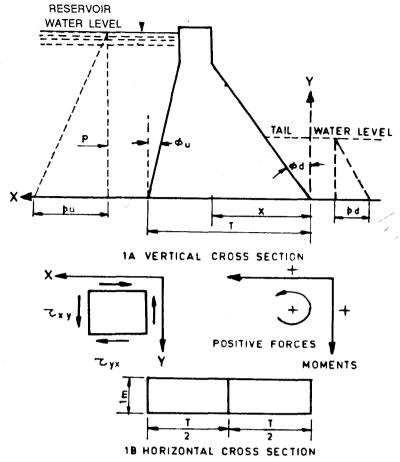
Sign Convention for the Forces Acting on the Dam Section
